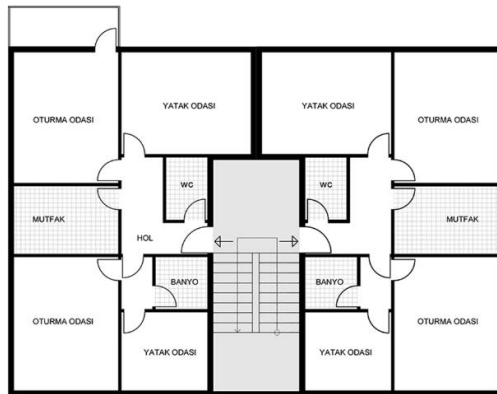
Two-room plan type from the Şekertepe building cooperative houses. Three rooms were added to the structure later. (Filiz Sönmez Archive, 2022).
